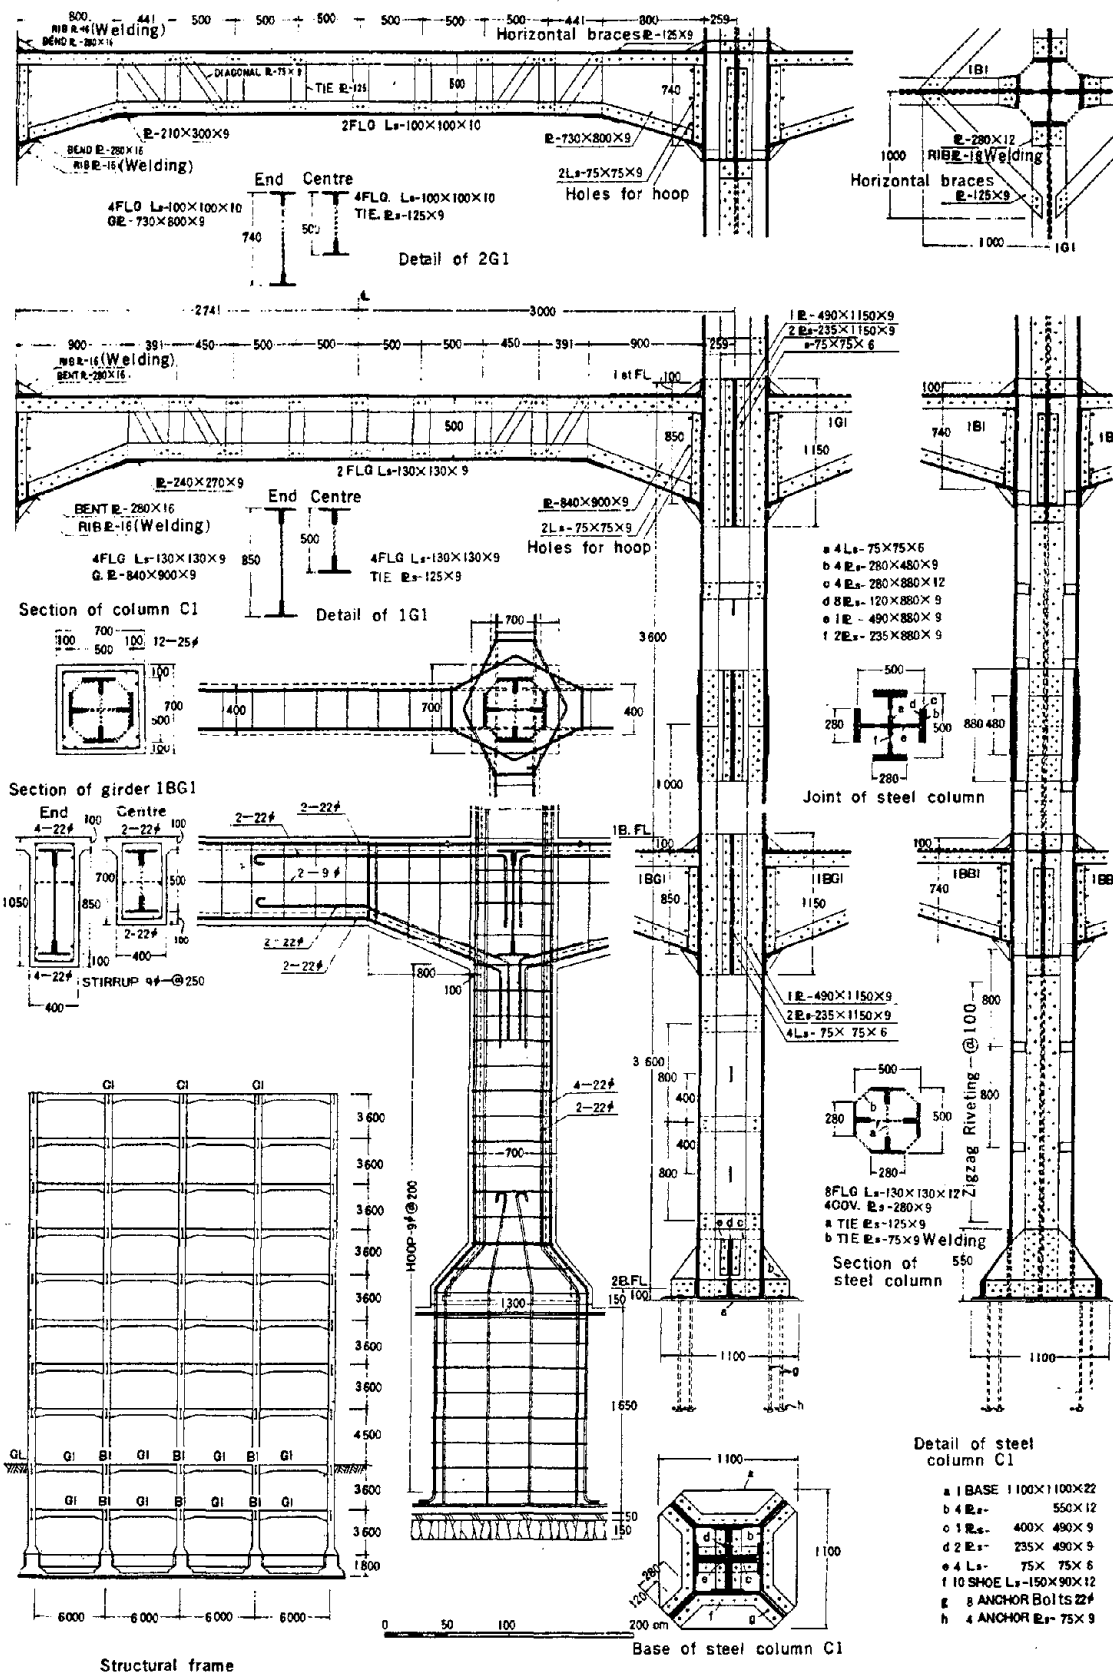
Construction details for SRC [AIJ, 1960]
